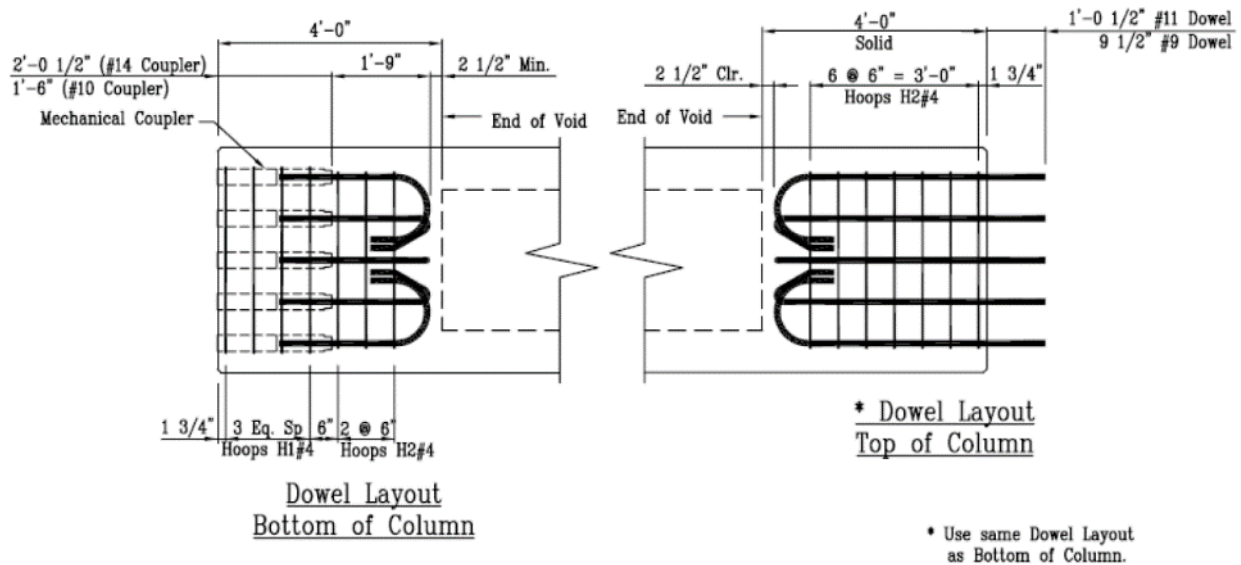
Column connections proposed by Fouad et al. (2006)
